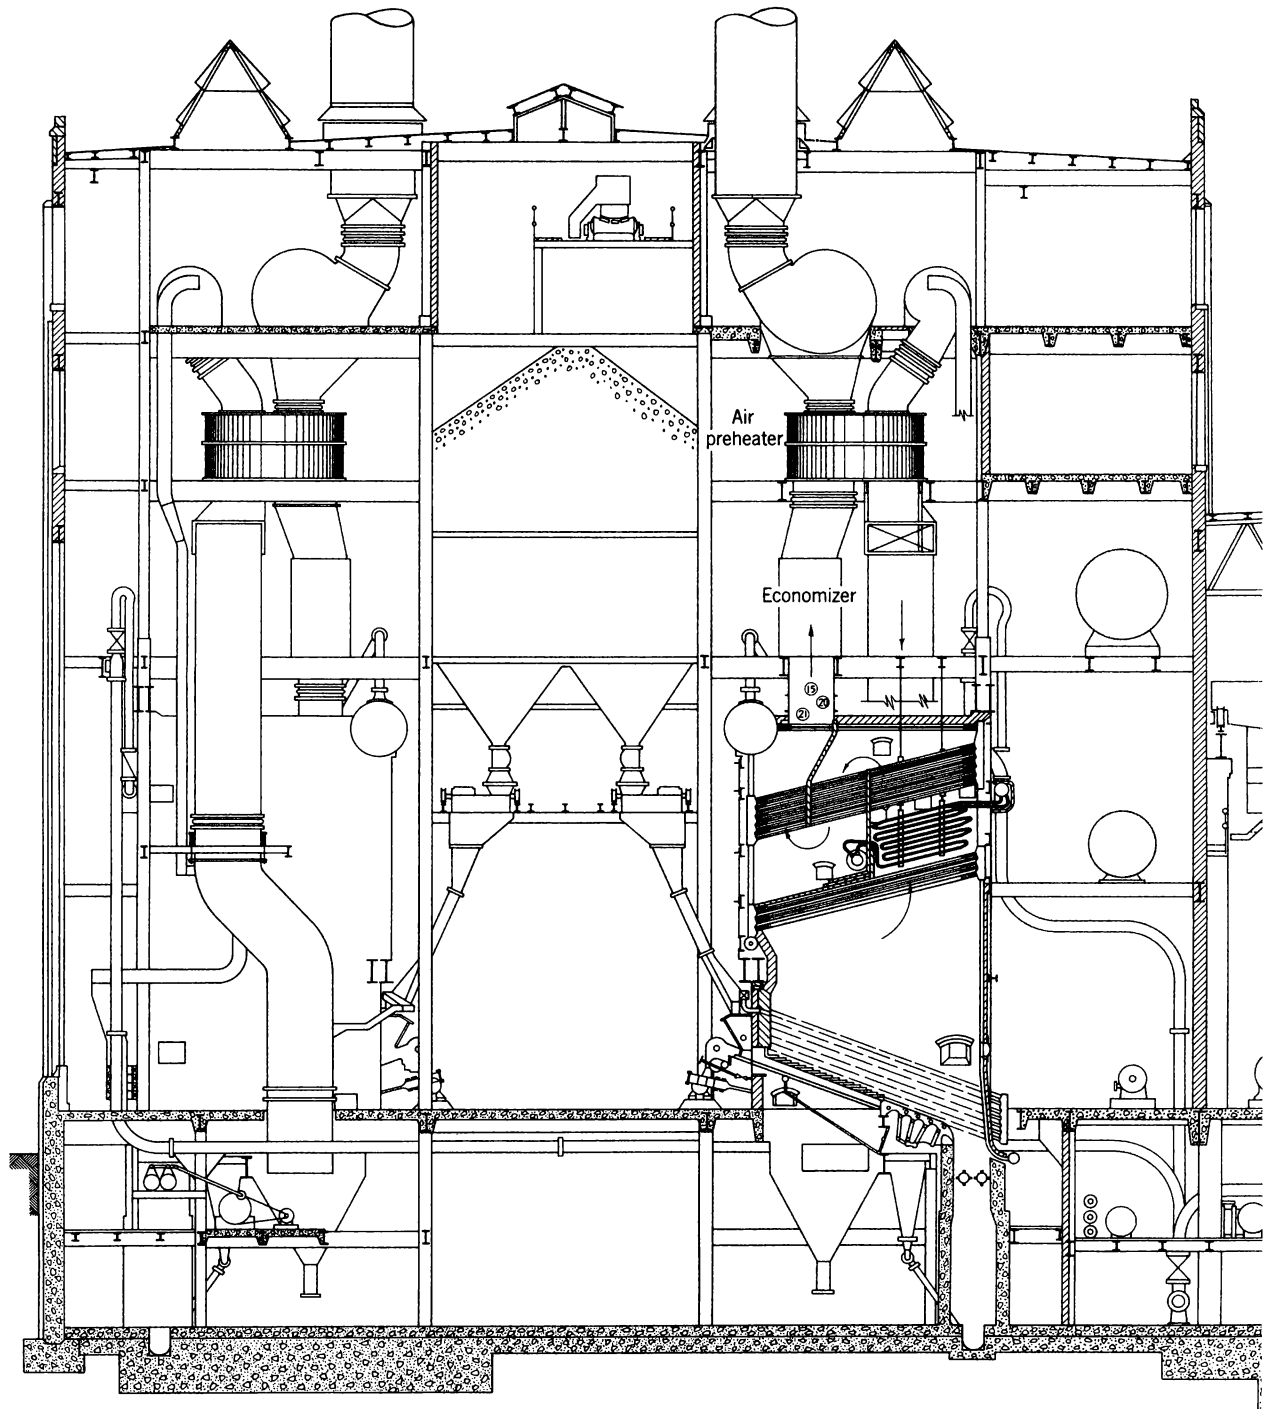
General Cross Section of Boiler Equipment Used at Harding Street Station.
